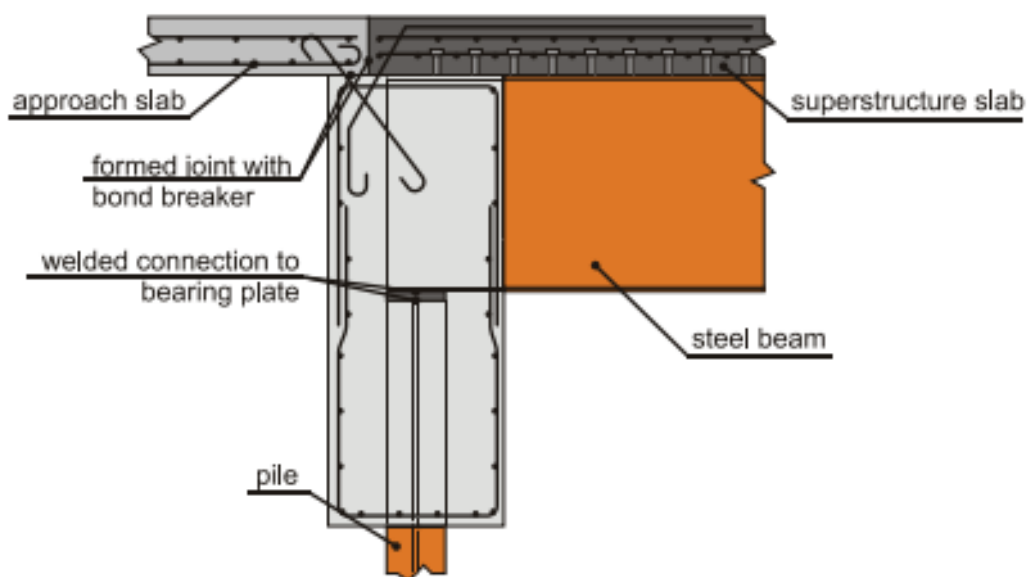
Connection between piles and girders (Feldmann et. al. ,2010)
